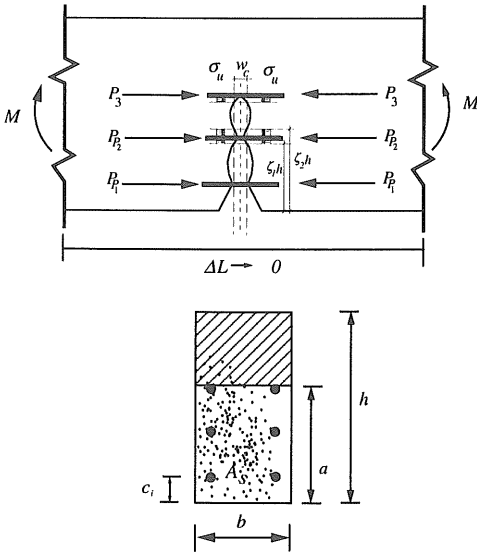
Scheme of a cracked reinforced concrete element containing fibers.
